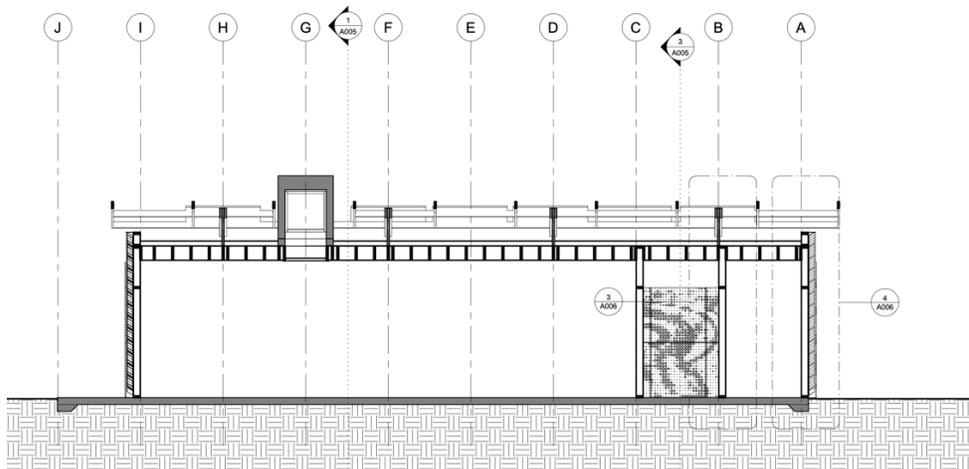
Longitudinal Section: KSU Mini Pavilion with Structural Grid. (Michael Carroll 2022)
